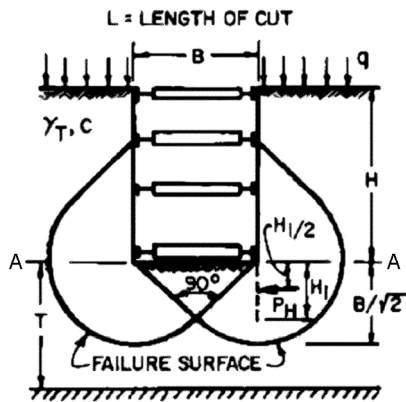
Diagram Illustrating Assumed Mechanism for Failure by Heave of the Bottom of a Wide Excavation
